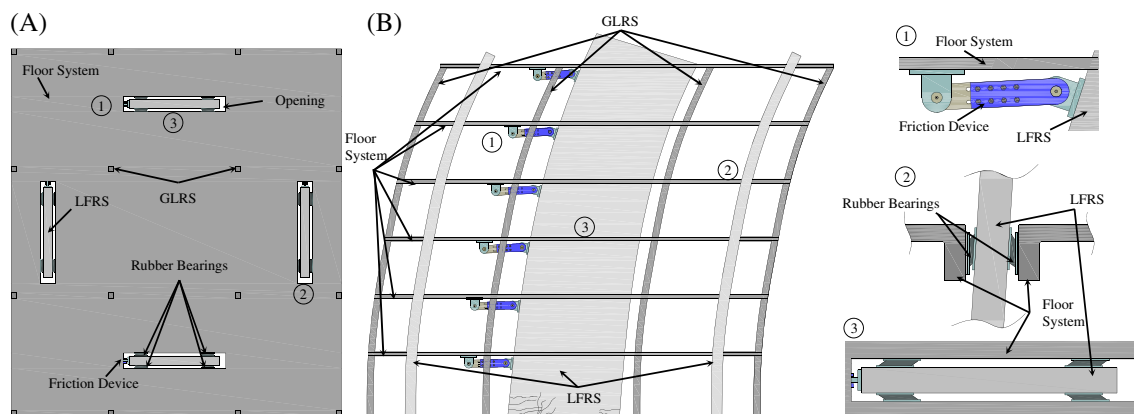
Friction device (FD) + rubber bearings (RB) deformable connection within reinforced concrete shear-wall building: A, plan view; B, elevation and close-up of (1) relative vertical motion between lateral force resisting system (LFRS) (ie, shear wall) and floor, (2) relative rotation between LFRS and floor, and (3) relative horizontal motion between LFRS and floor [Colour figure can be viewed at wileyonlinelibrary.com]
